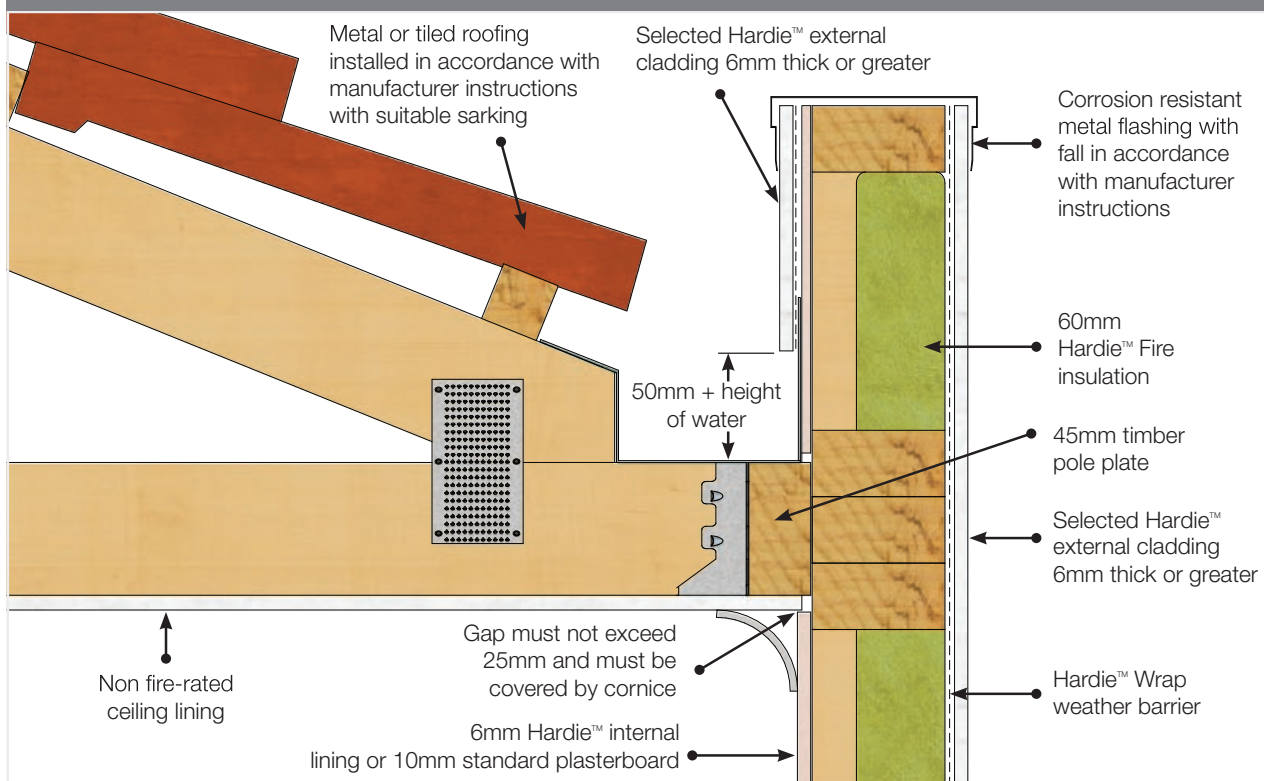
EXTERNAL BOUNDARY WALL TO PARAPET ROOF
